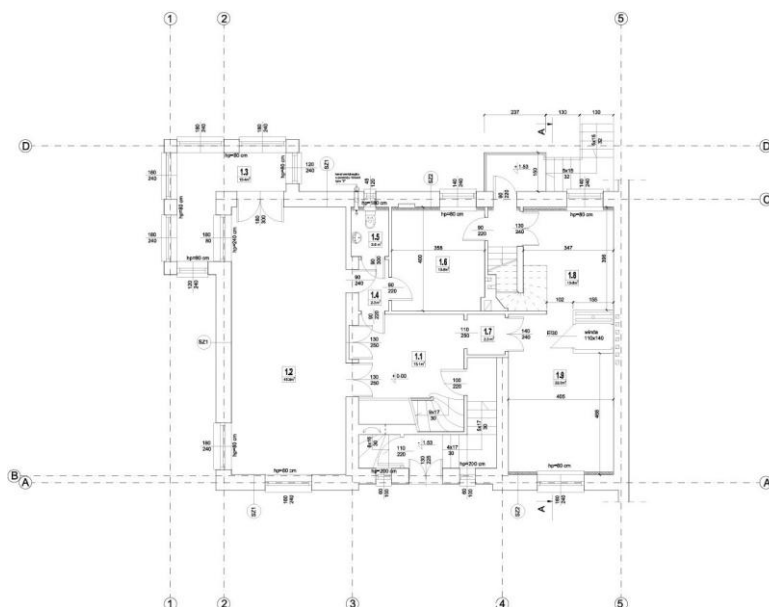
Ground floor plan of the building - construction design (author of the design: architecture Nina Sołkiewicz-Kos; construction: Jarosław Paluszyński and Andrzej Kysiak). On the ground floor of the building, there will be an exhibition space for exhibitions, conferences and meetings of environmental groups. There is also space for a library related to the history of Częstochowa
